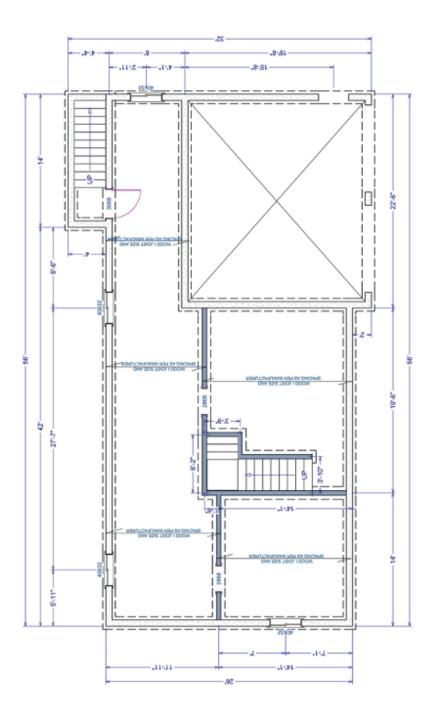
Main Floor Floor-Plan (Collins Homes & Renovations Ltd, 2021)
